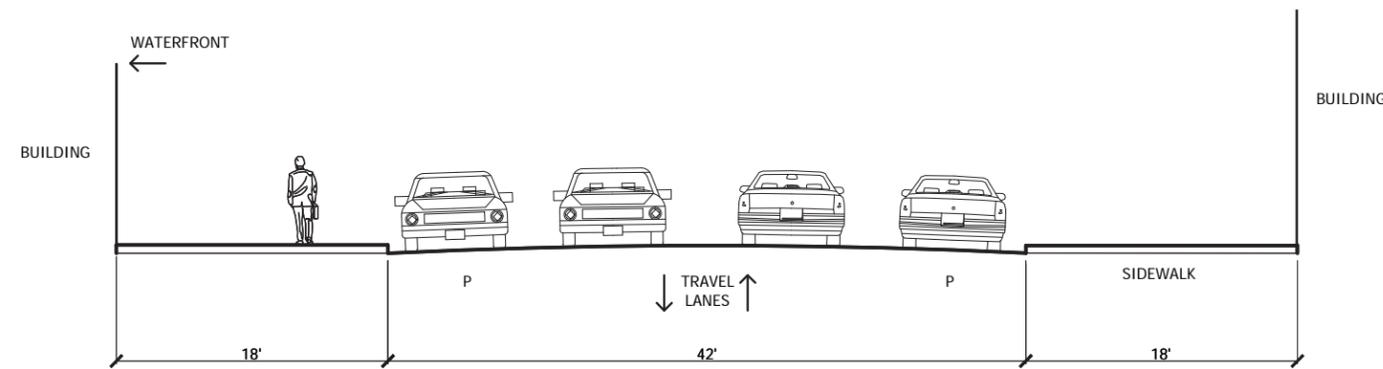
Existing configuration on Second Avenue between 39th and 44th Streets
